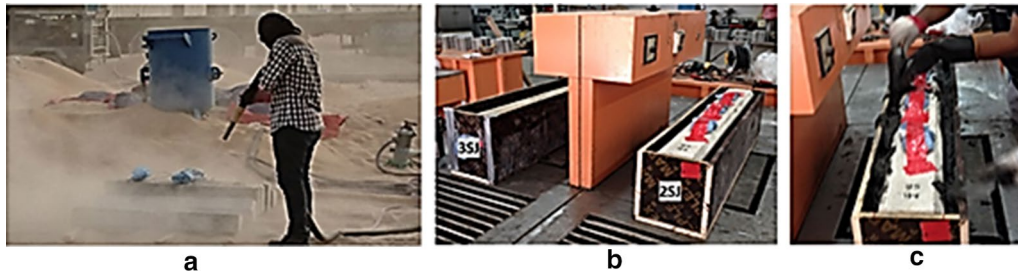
a Applying sandblasting, b placing sandblasted RC beam in mold, c casting UHPC directly on the RC beams.
